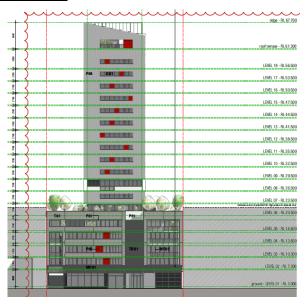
Front elevation (Bertie Street), of previous decision plans for MINRA 0005/2016.
